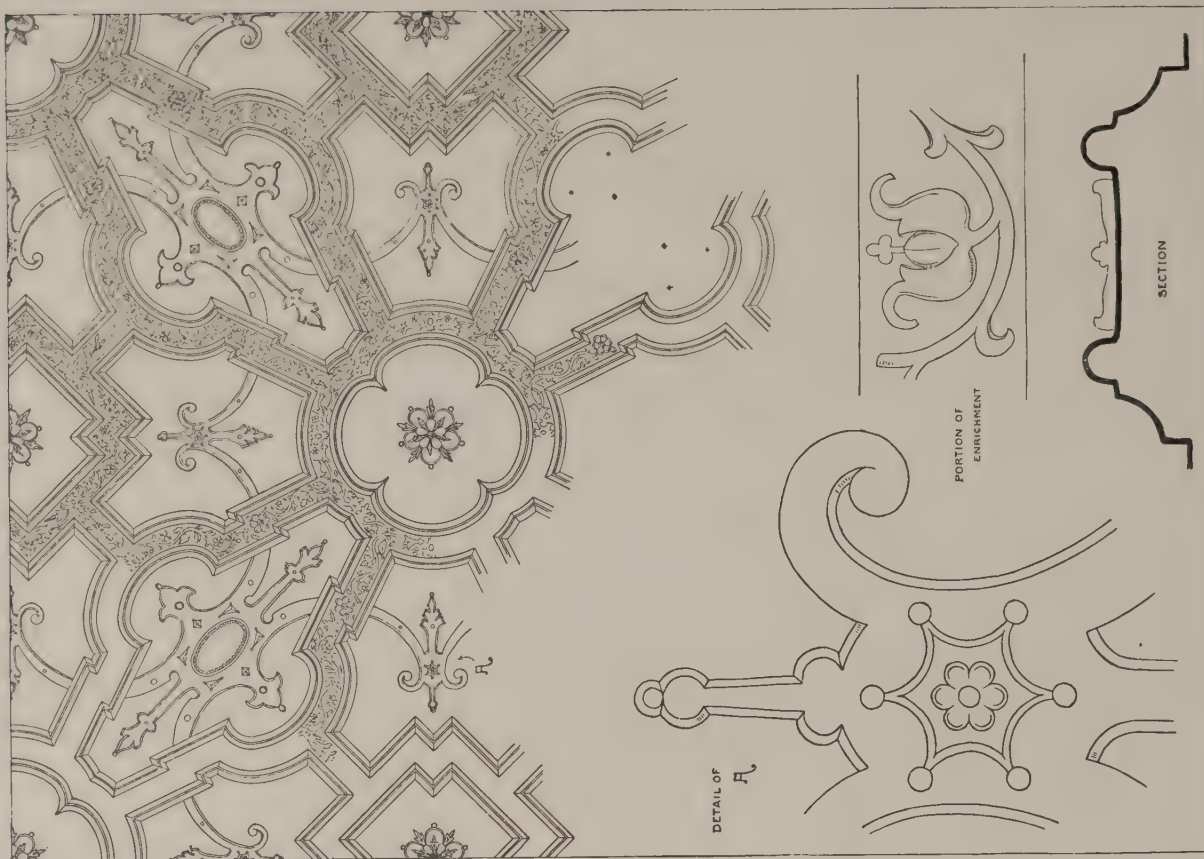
DETAIL OF PLASTER CEILING, ALBYNS, ESSEX.
